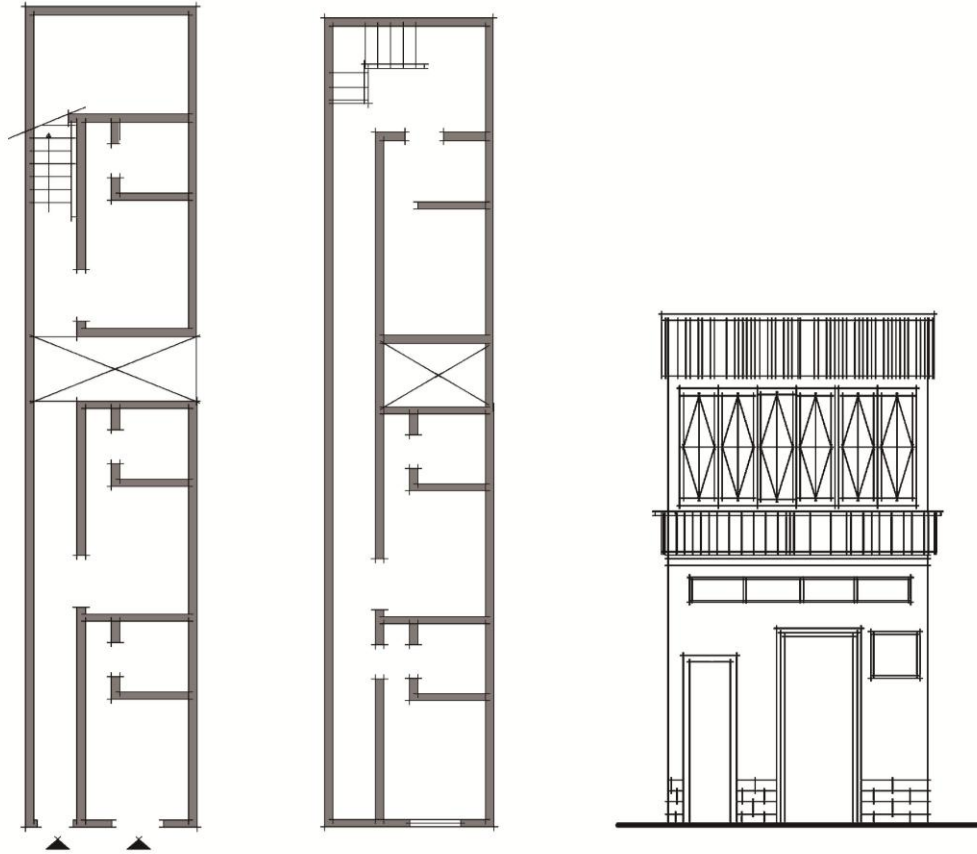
A sample floor plan and façade of a *zhutongwu* apartment
